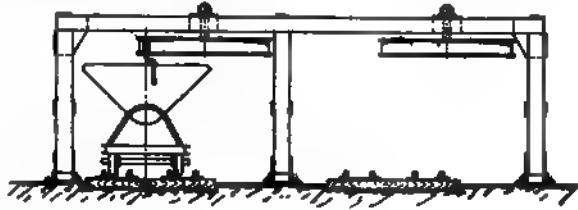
Automatic Trucks in connection with Rope Haulage Plant.
